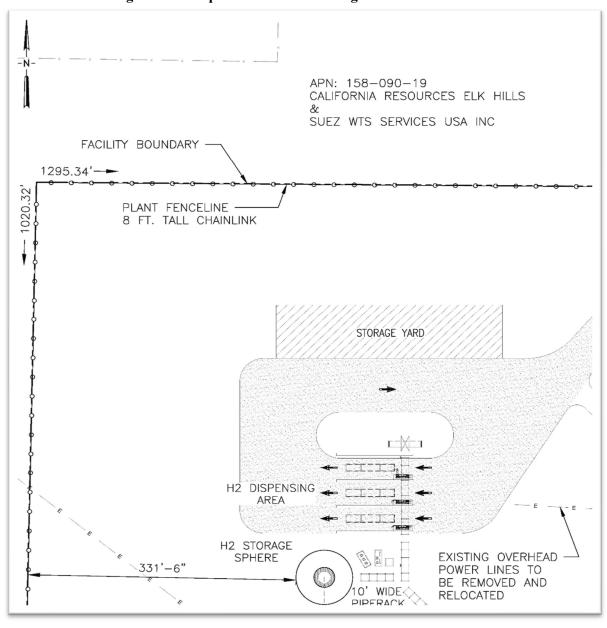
Proposed PD Plan - Enlarged Northwest Site Plan
